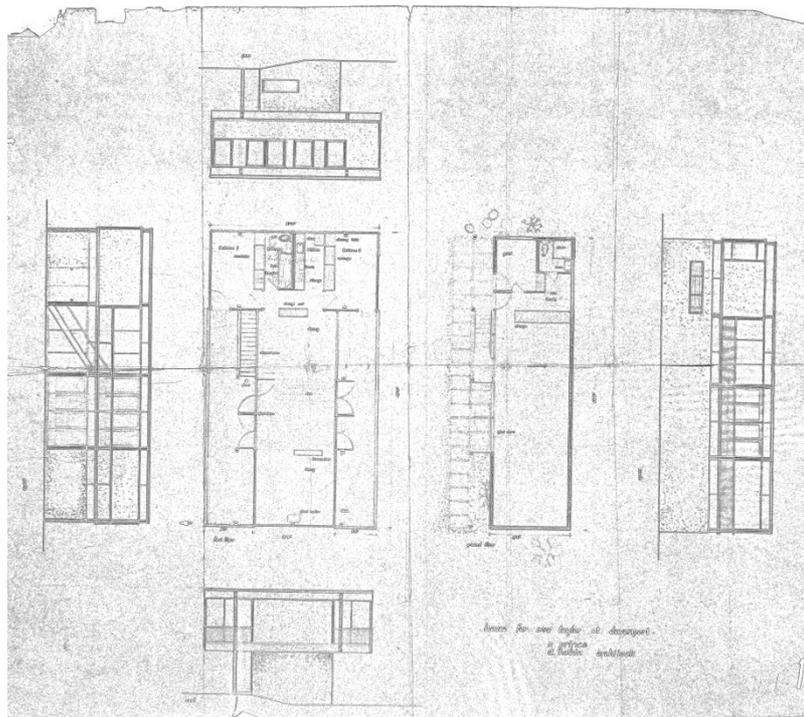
Plan and Elevations, Taylor House, Devonport, 1952. (Source: NSCC)
